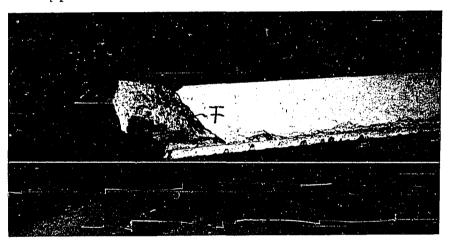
Cross-section of shear-bond failure crack of beam shown in Fig. 13
